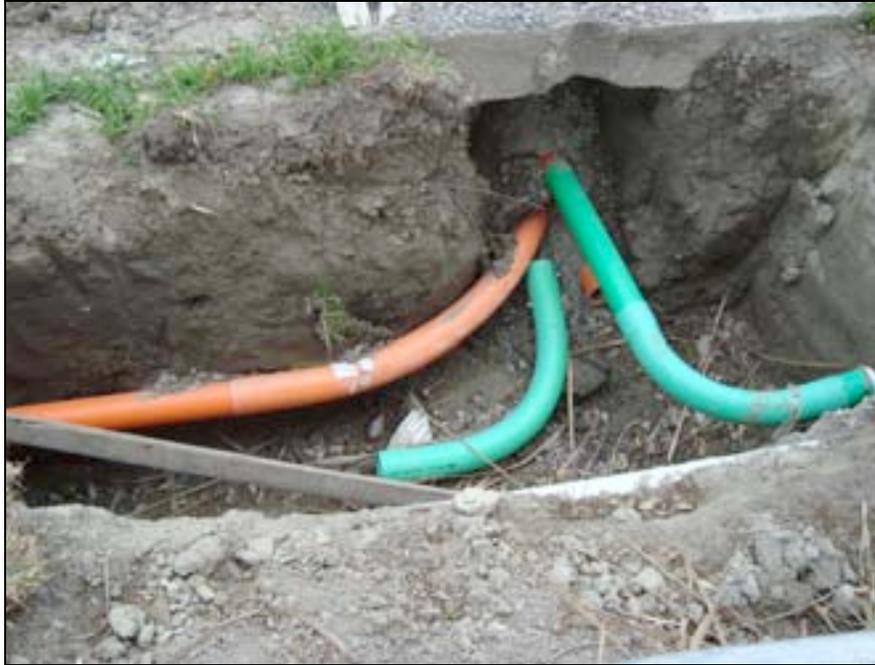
Under ground telecommunication cables repair, plastic ducts were used in this area northeast of Christchurch.
